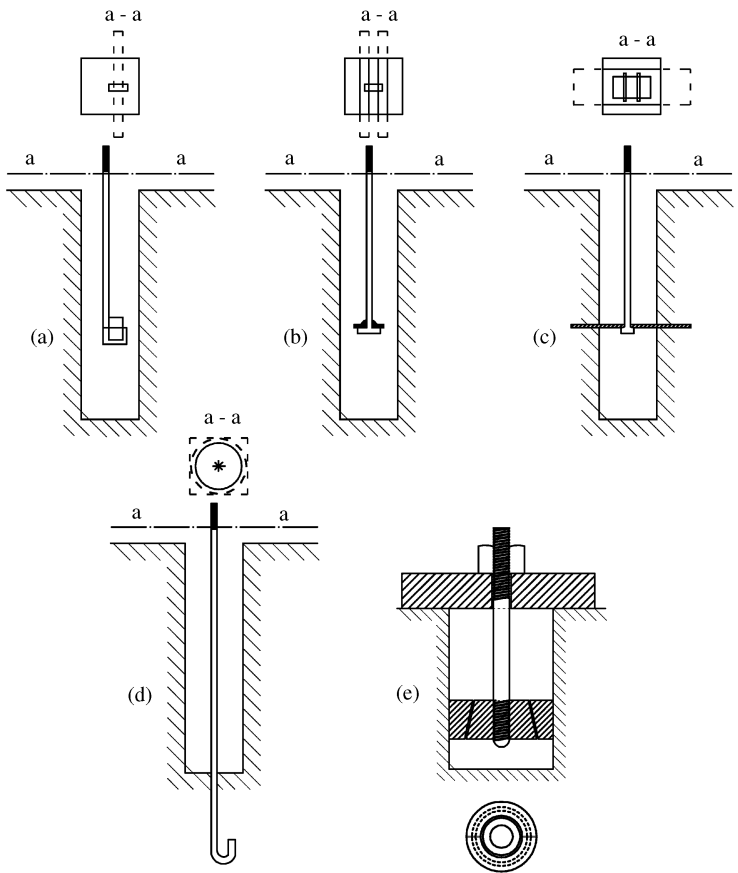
C.8 Details of anchor bolt fixtures. (a) Fastening anchor bolt with cast-in flat iron. (b) Fastening anchor bolt with angle iron. (c) Fastening anchor bolt with cast steel plate. (d) Anchor bolts welded to tube bottom. (e) Fixing with expanding wedge and with upper and lower threads.
